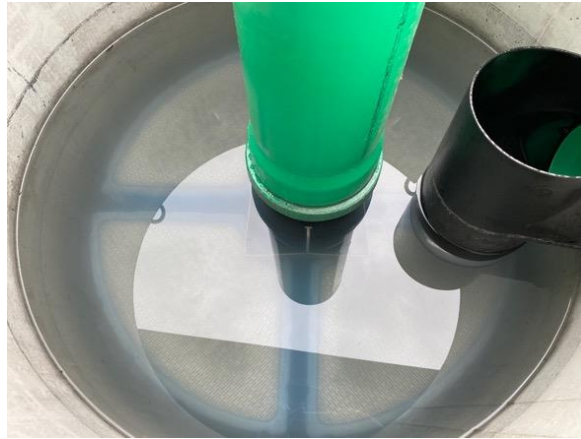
View from Top into a Concrete Manhole Version (HCFC-4)
